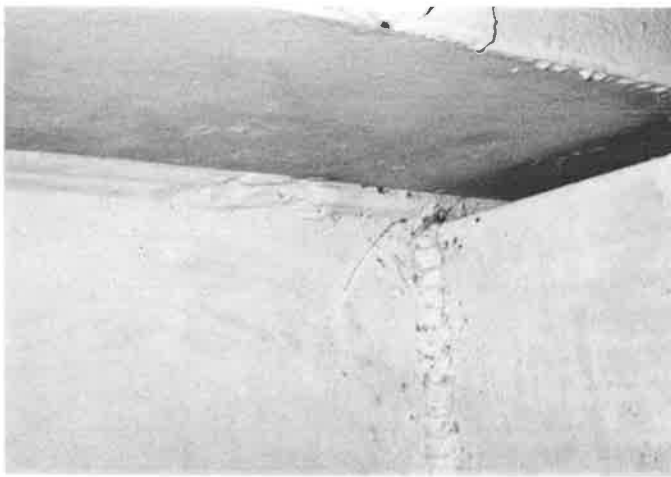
Crack Through Web of Girder "T" Type Pier Web Connection of the Center Beam.
